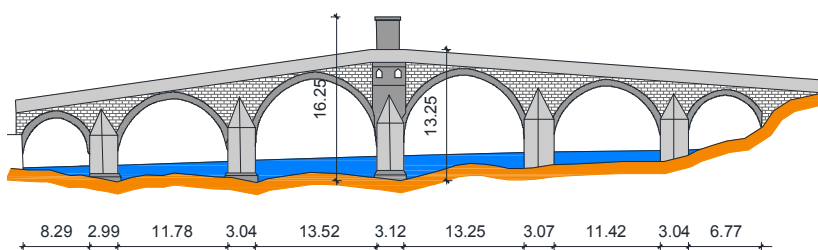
Longitudinal layout of the Old Bridge in Konjic.
